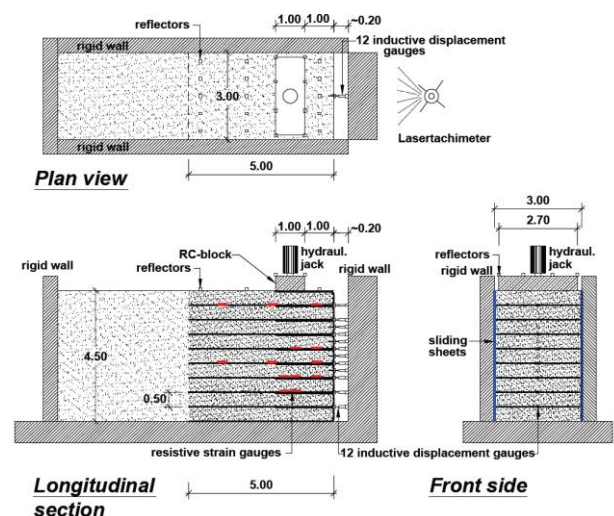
Test wall and measurement equipment, Alexiew and Detert (2008)
